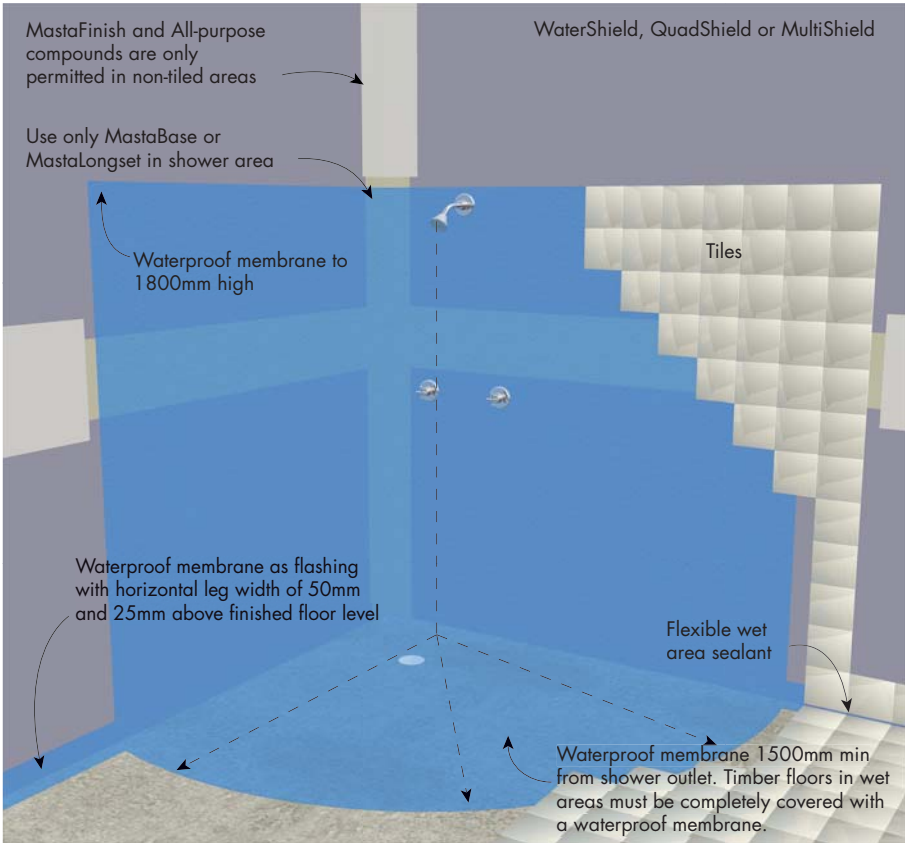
Internal In Situ Tray for Unenclosed Shower on Concrete or Compressed Fibre Cement Floor
